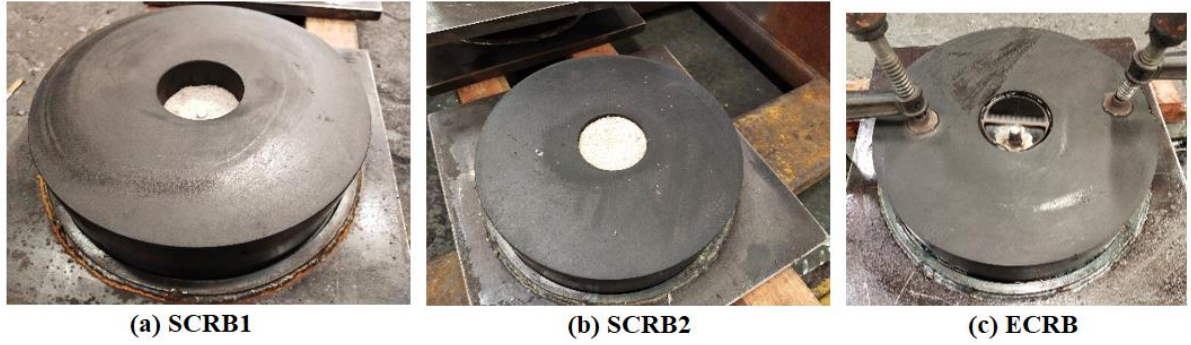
Elastomeric bearing prototypes prepared after filling process
